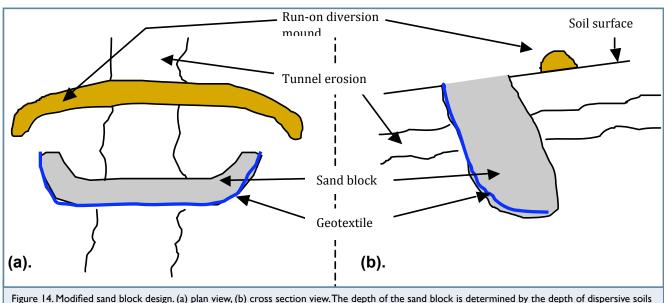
Modified sand block design. (a) plan view, (b) cross section view. The depth of the sand block is determined by the depth of dispersive soils or tunnel erosion. The span length of the structure is determined by the width of the tunnelling.
